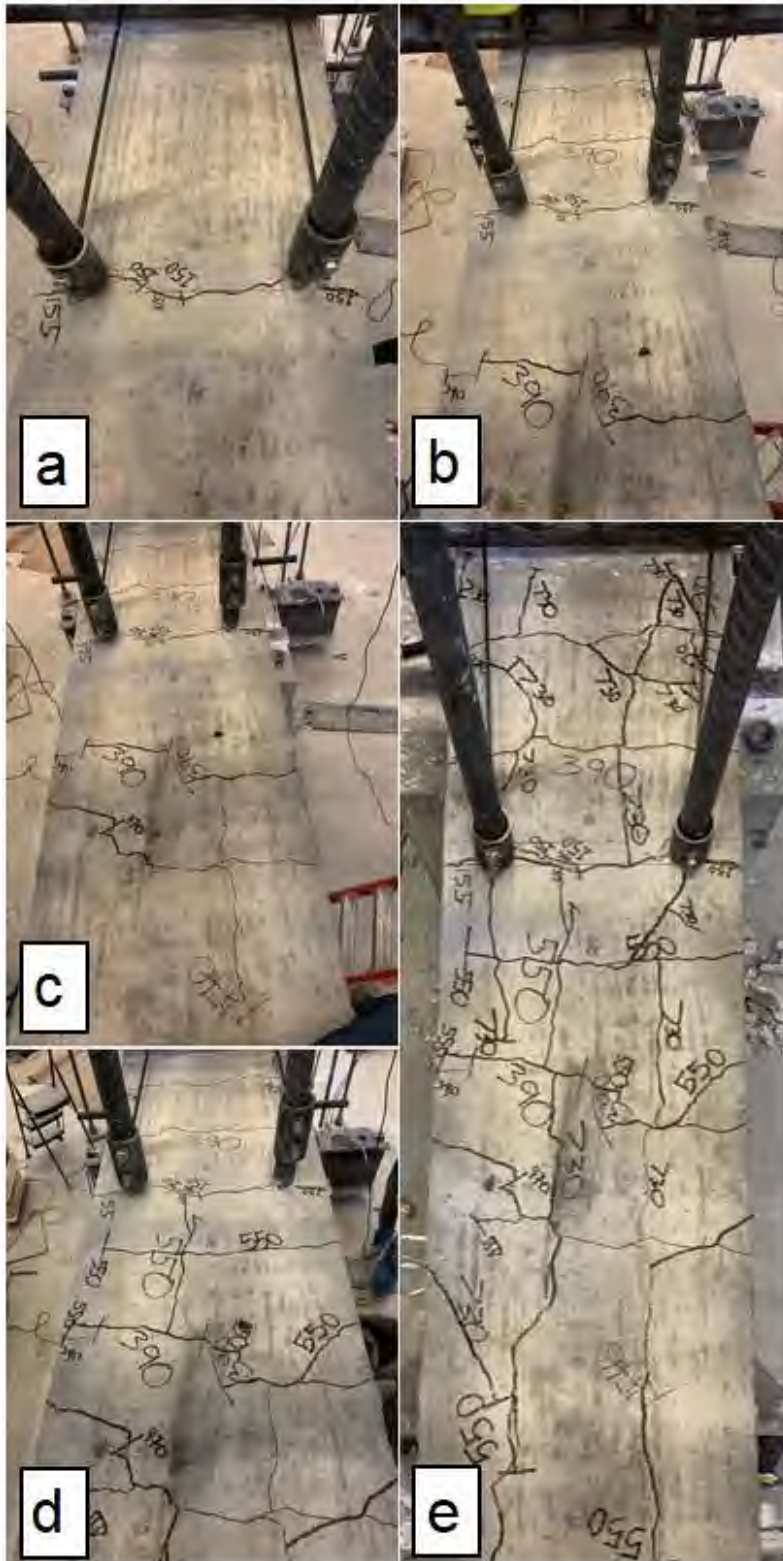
Example of cracking pattern in headed bar specimens (top face, specimen 18-3): (a) Crack between bars likely initiating due to bar slip, (b) Cracks branching towards bearing members, (c) First diagonal crack due to shear in joint, (d) and (e) Cracks propagating throughout the joint
